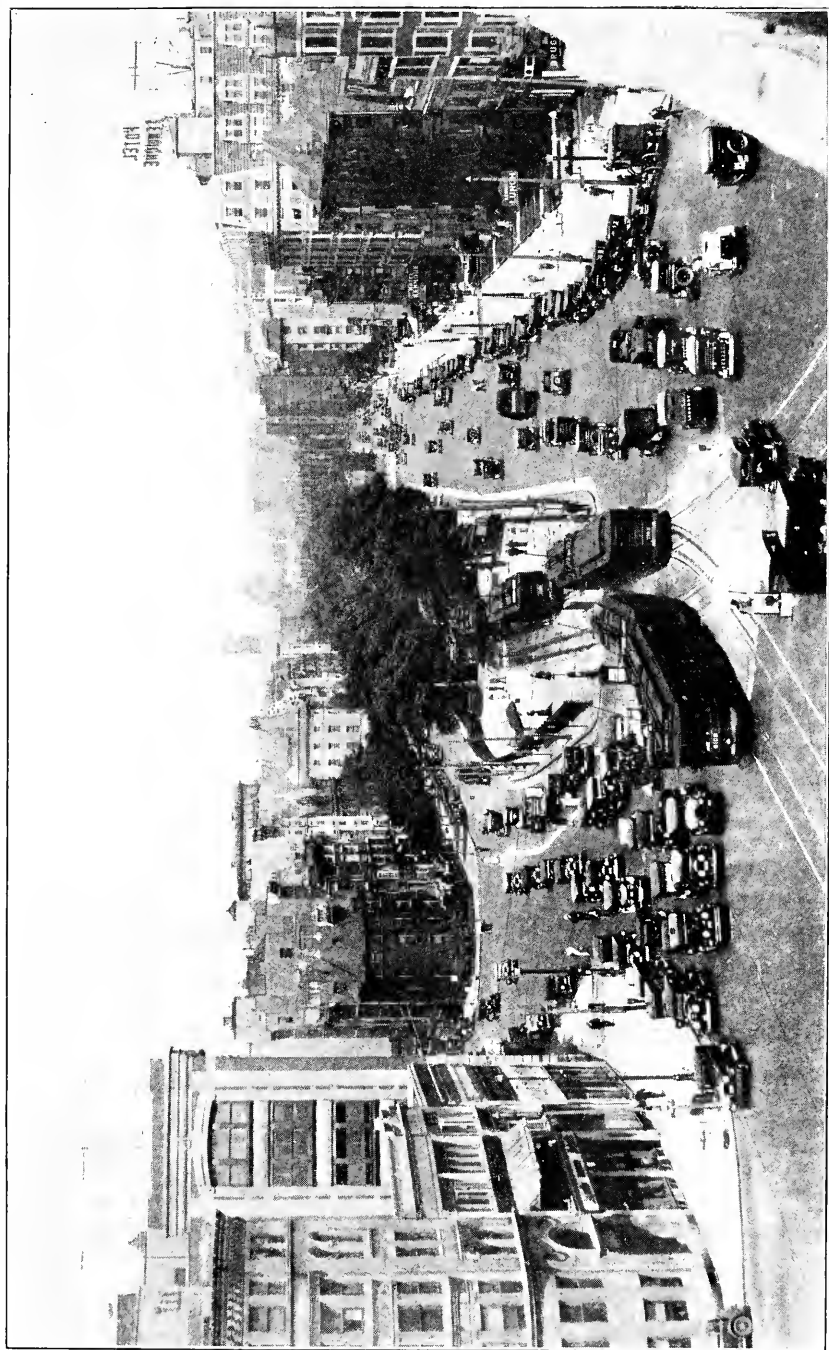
PLATE II.—GENERAL VIEW OF GOVERNOR SQUARE, TAKEN JUST PRIOR TO BEGINNING CONSTRUCTION OF SUBWAY EXTENSION.
